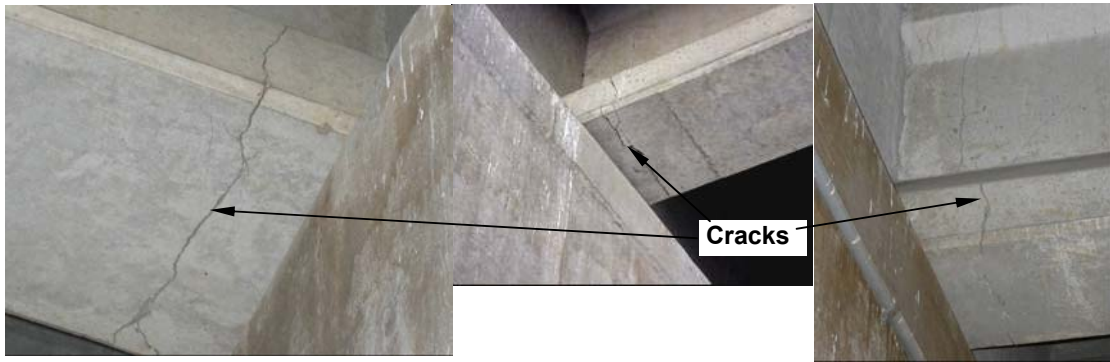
Cracks on prestressed concrete I-girders on the elevated portion of I-65 Highway Bridges.
